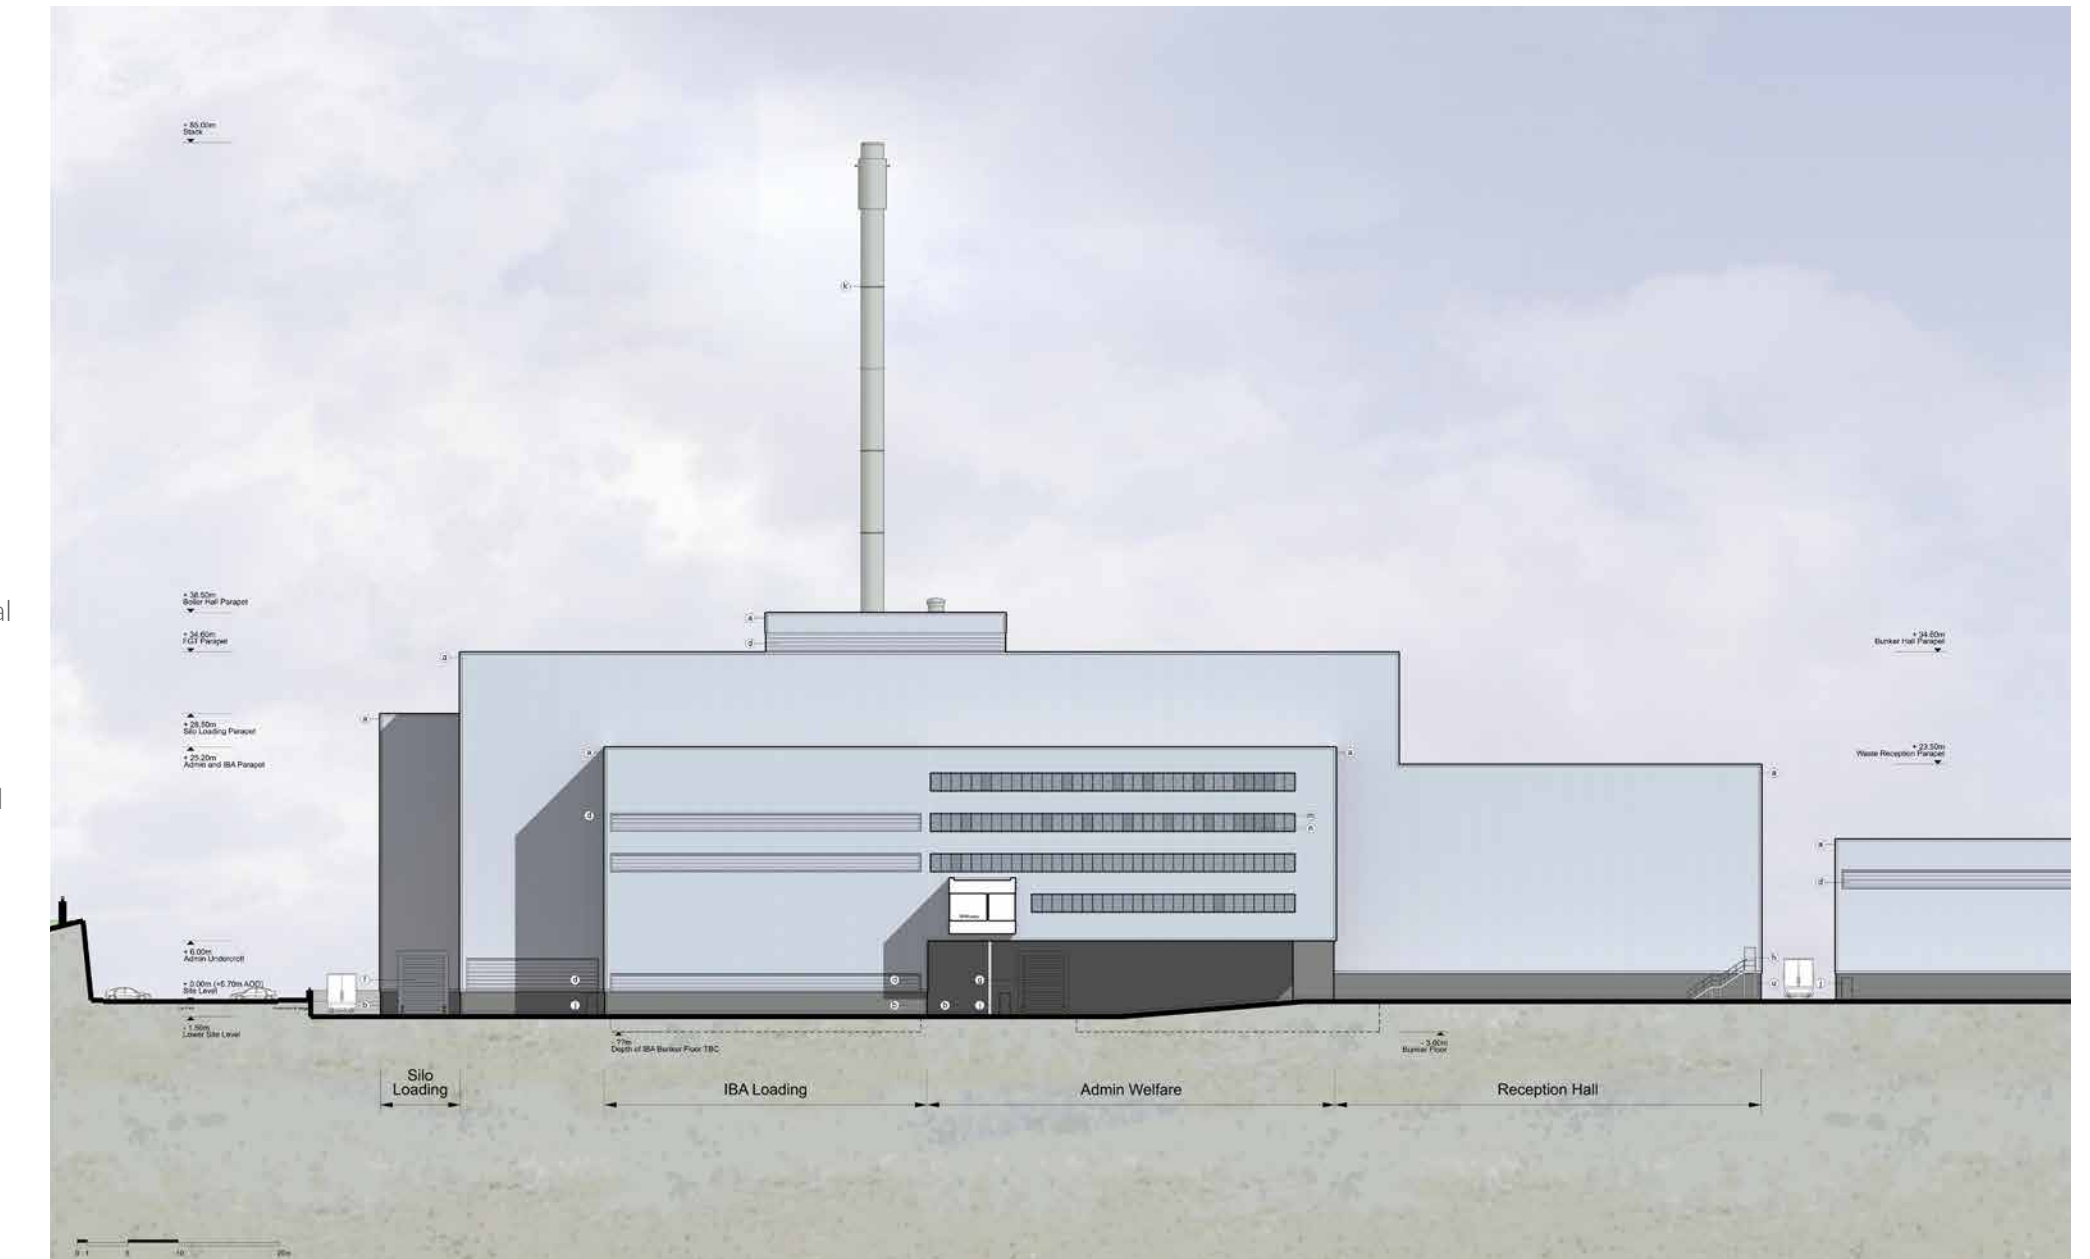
Proposed ERF west elevation – extract from drg PL303
